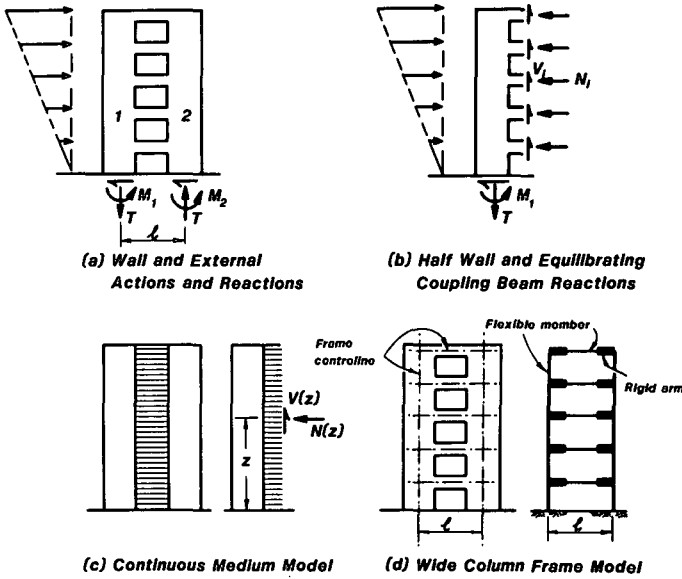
Mathematical Models for Horizontally Loaded Coupled Structural Walls
